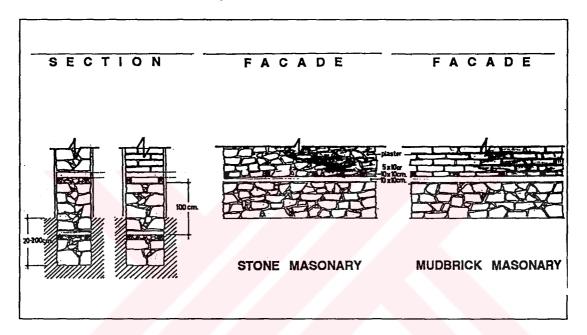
Use of Timber Lintels in Masonry Walls in Ankara Houses
